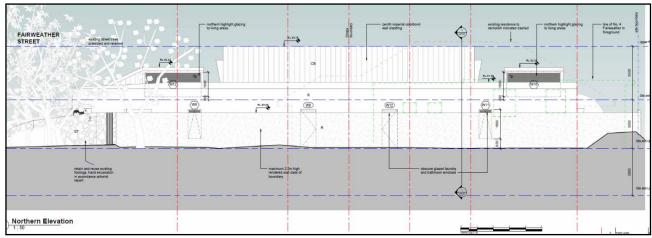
Northern Elevation. Source: Submitted Architectural Plans
